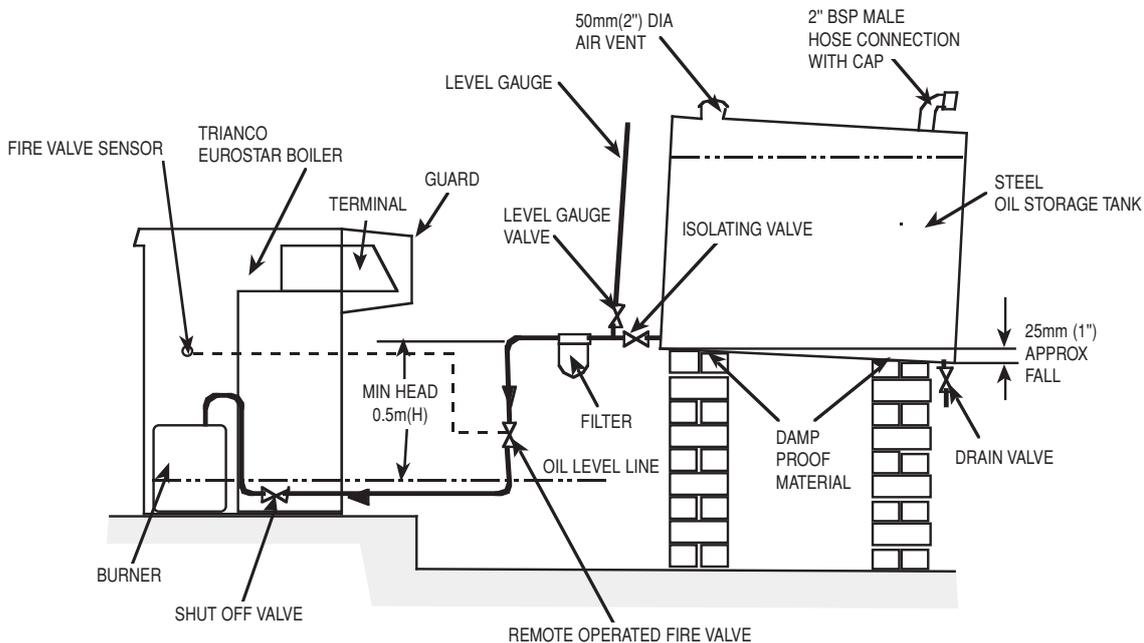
SINGLE PIPE OIL SUPPLY INSTALLATION
